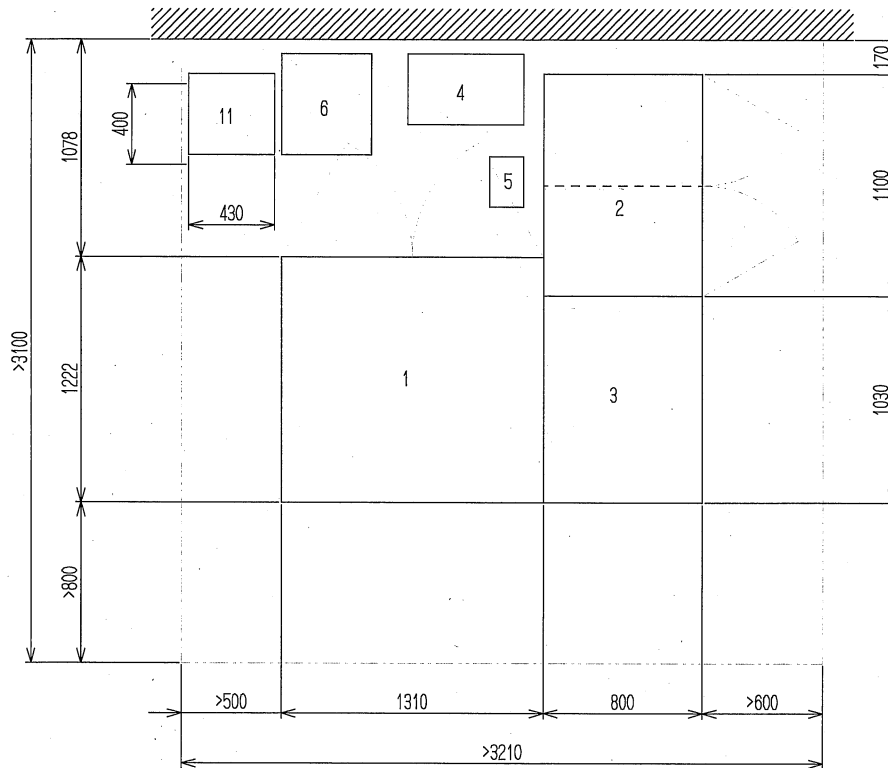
Temporary Voltage Loss Protective Equipment Installation Example
